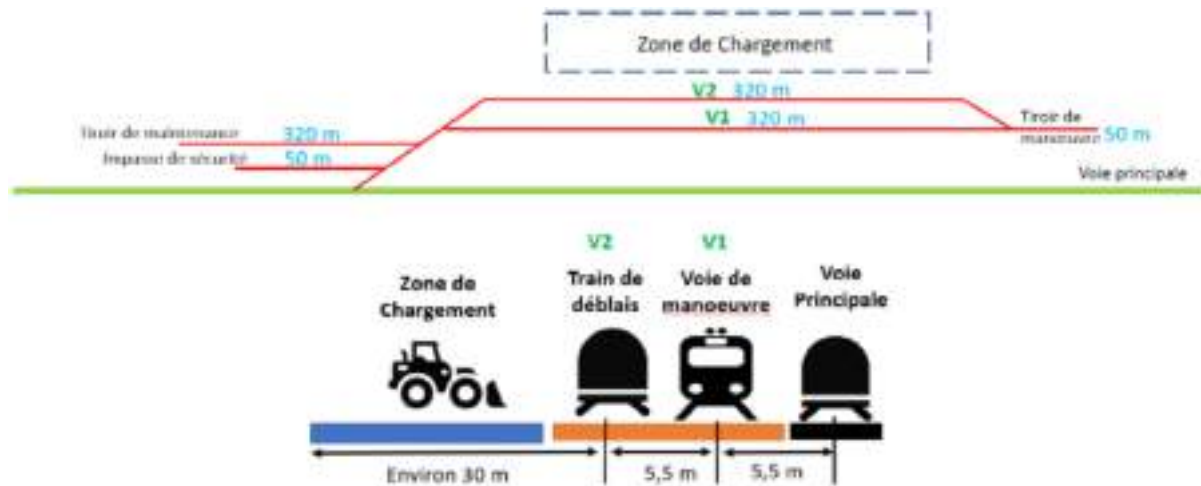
Minimum space requirements of a new railway access for goods transport
